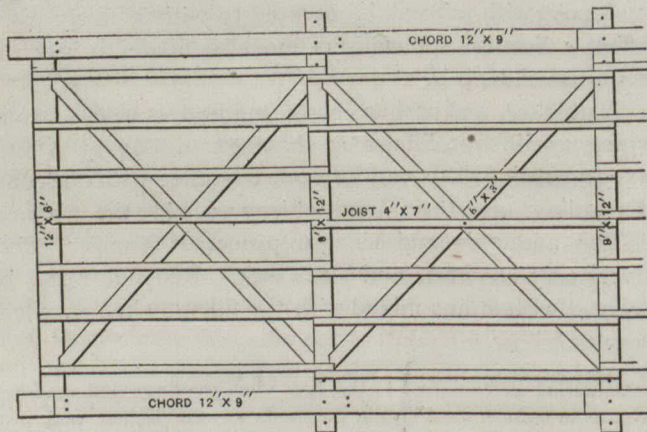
FRAMING OF DECK TIMBER. 1/8 INCH TO FOOT.
